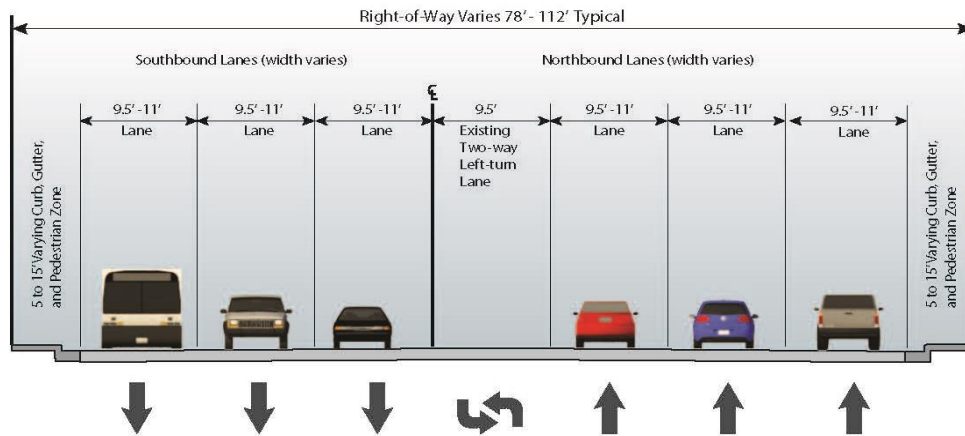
No-Action Alternative between West 10th Avenue and West Howard Place
